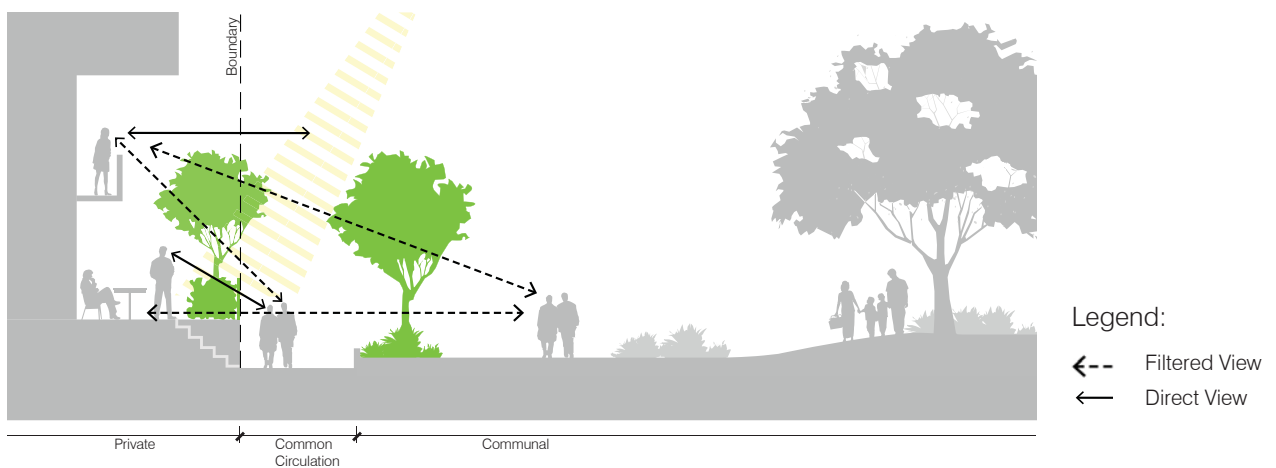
Elevated ground floor and trees can help restrict and filter views between private and communal space
